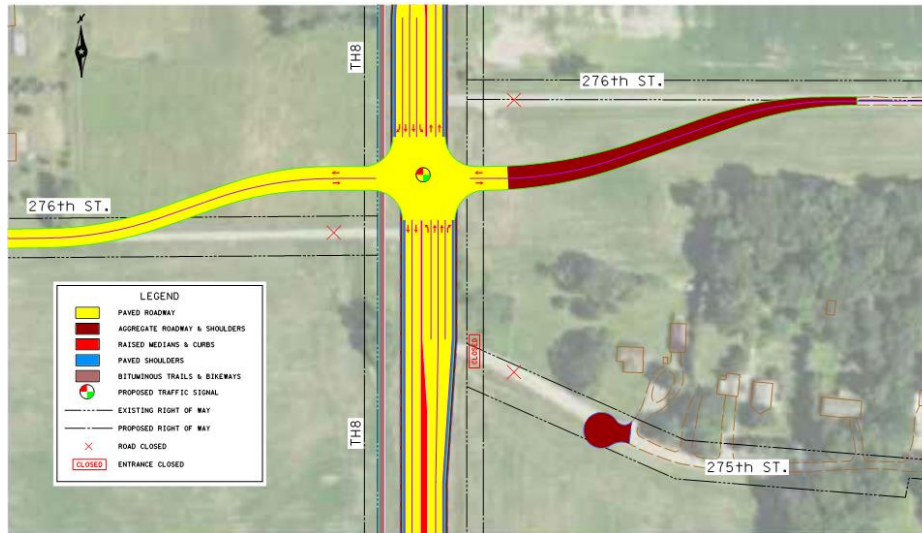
(#) depicts the plan view of the signalized intersection and access management improvements at 275th street and 276th street including closing access to 275th street, adding a raised median and an additional lane to east and west bound on TH8, realigning the existing 276th street, and adding right- and left-turn lanes along TH 8. Figure 4 is one of seven plan views. [Link](#) includes plan views of all seven intersection improvements and one full view of the Project.
